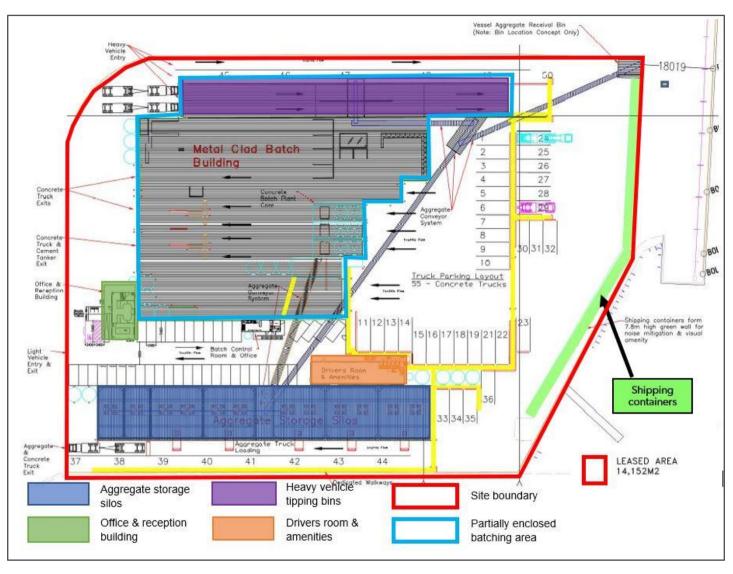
| Plan view of proposal (Base source: Applicant's RtS)
